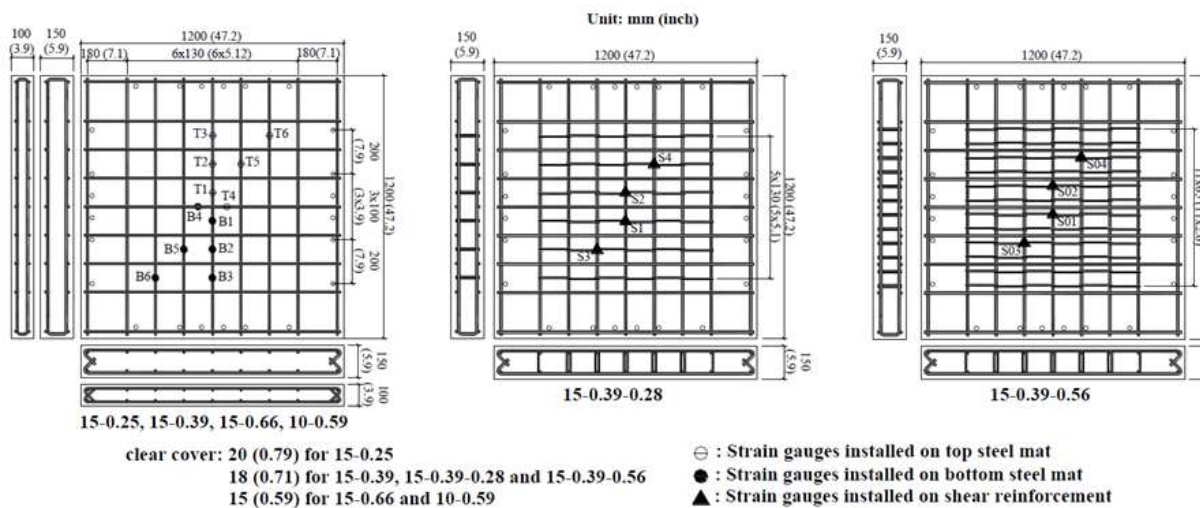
Reinforcement layout of slab specimens tested by Xiao, Li [1]
